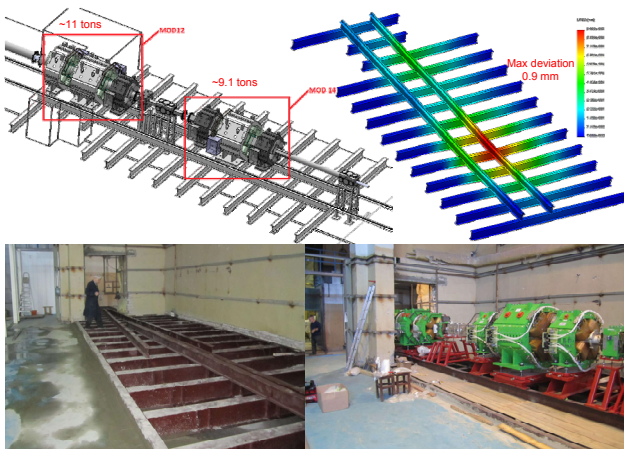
UP beam structure and deformation DOWN floor reinforcement and installed magnets.
